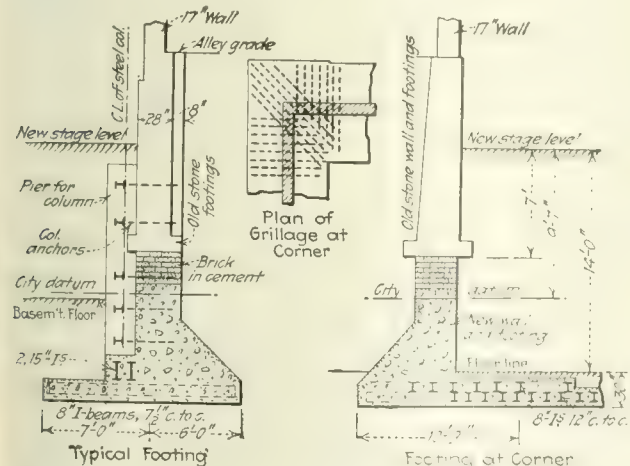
UNDERPINNING OLD WALLS WITH NEW WIDE-BASE FOOTING
